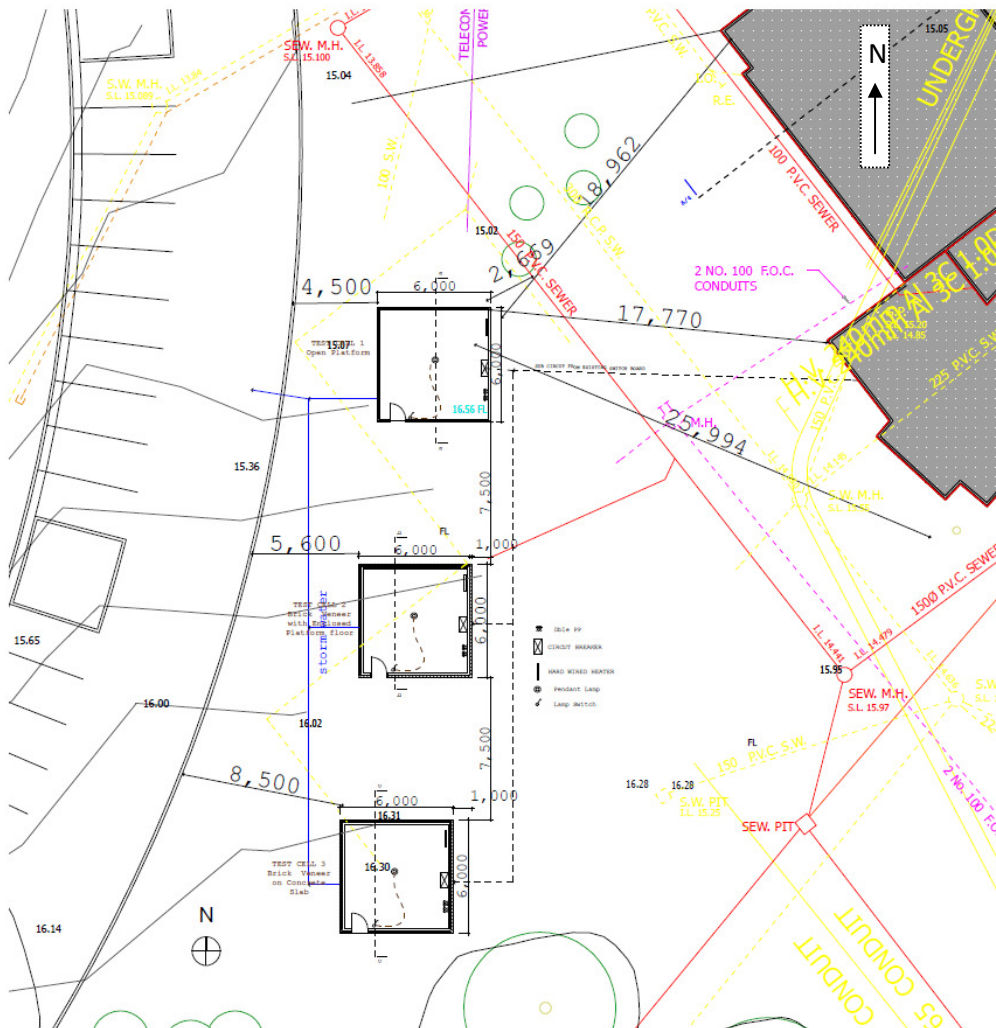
Site plan, not to scale (Dewsbury 2011)
